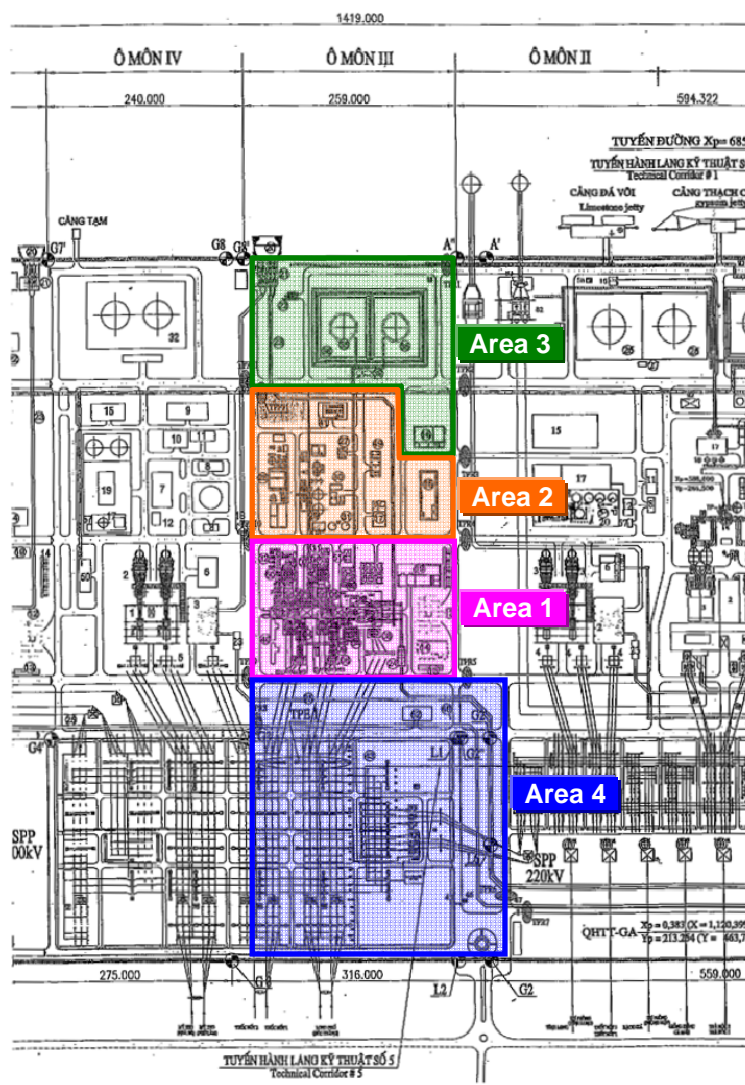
Arrangement of Area 1 ~ Area 4 for O Mon 3 Power Plant
